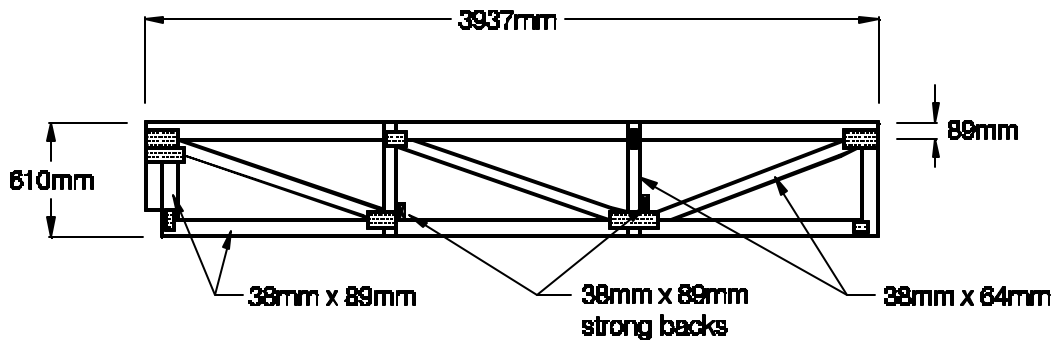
Construction of 610 mm deep wood trusses using 38 x 89 mm lumber.
